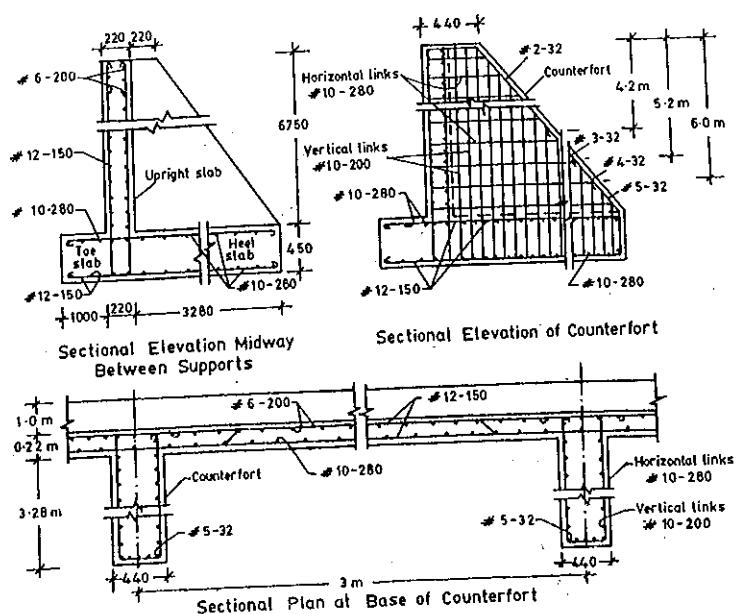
Reinforcement Details in Counterfort Retaining Wall
